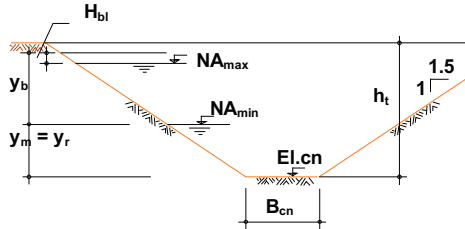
Typical cross-section of a headrace canal cut through soil (Case 3).
